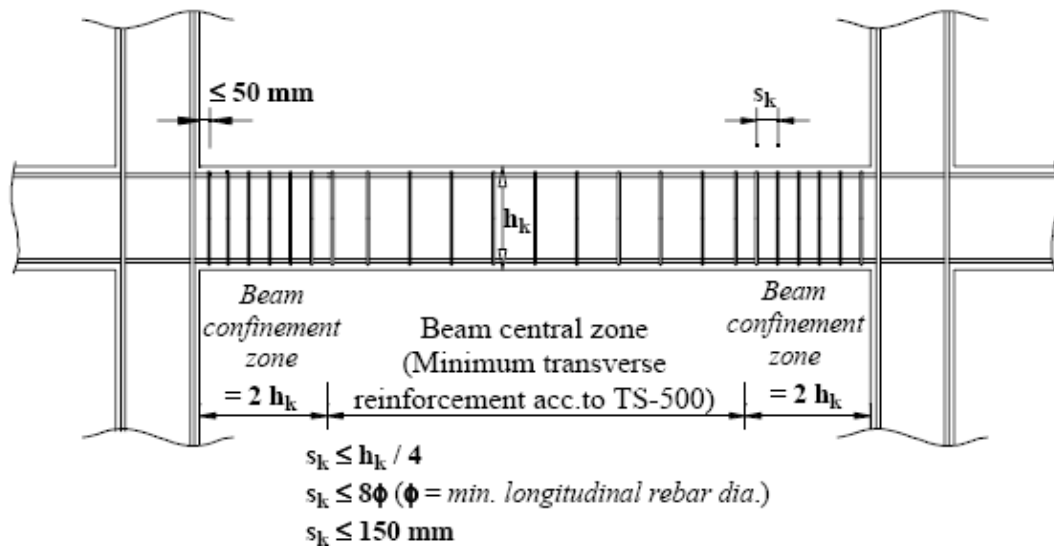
Transverse Reinforcement Layout Provisions for a Beam
